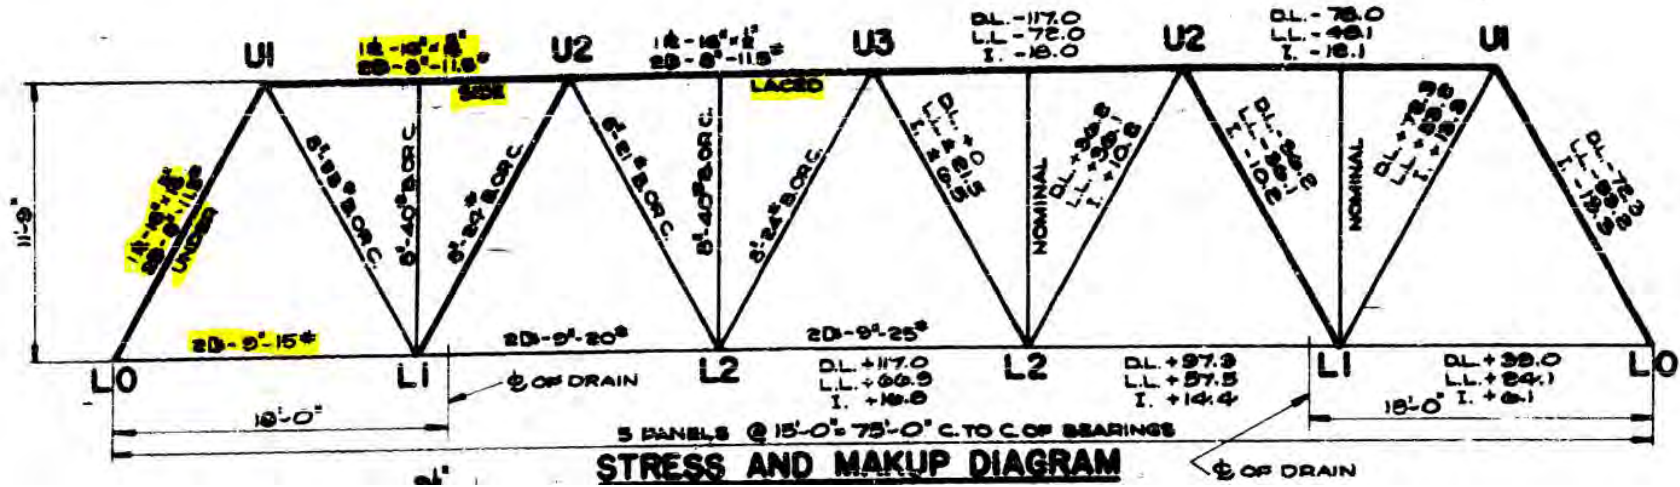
Cross section of the 1938 75-foot Warren with nominal verticals, T75-30 standard plan.¹¹
